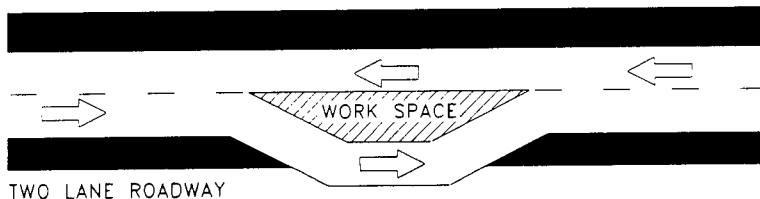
TEMPORARY BYPASS WORK ZONE
